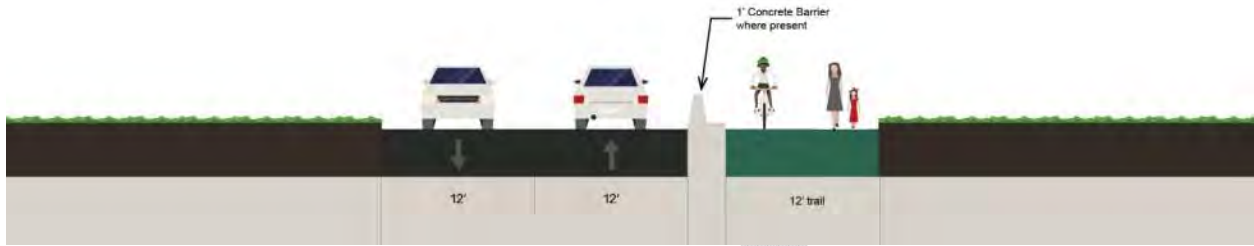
Beach Street (Eastbound) East of San Andreas Road to West of Lee Road
